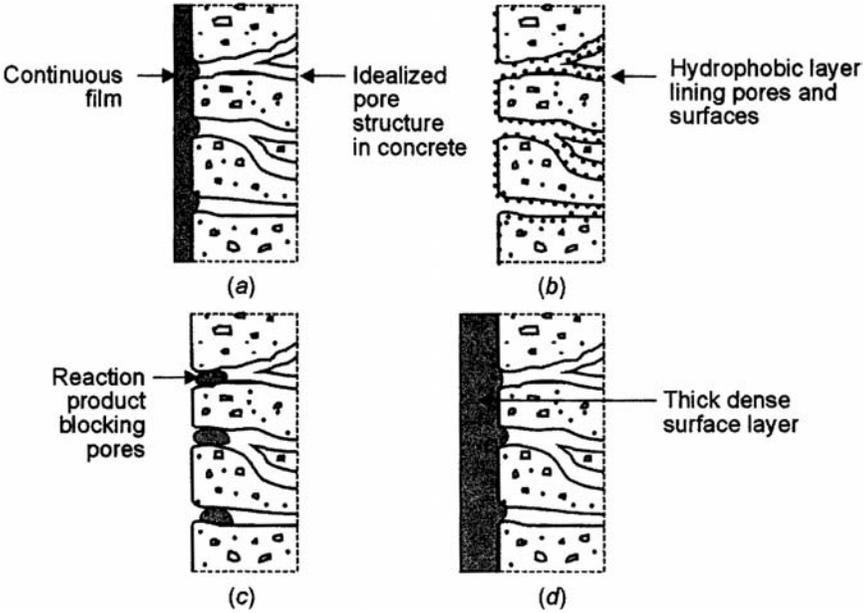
Schematic representation of different types of concrete surface protection: (a) organic coating, (b) pore-lining treatments, (c) pore-blocking treatments, (d) thick cementitious coating, shotcrete or rendering (source: Bijen (1989)).
